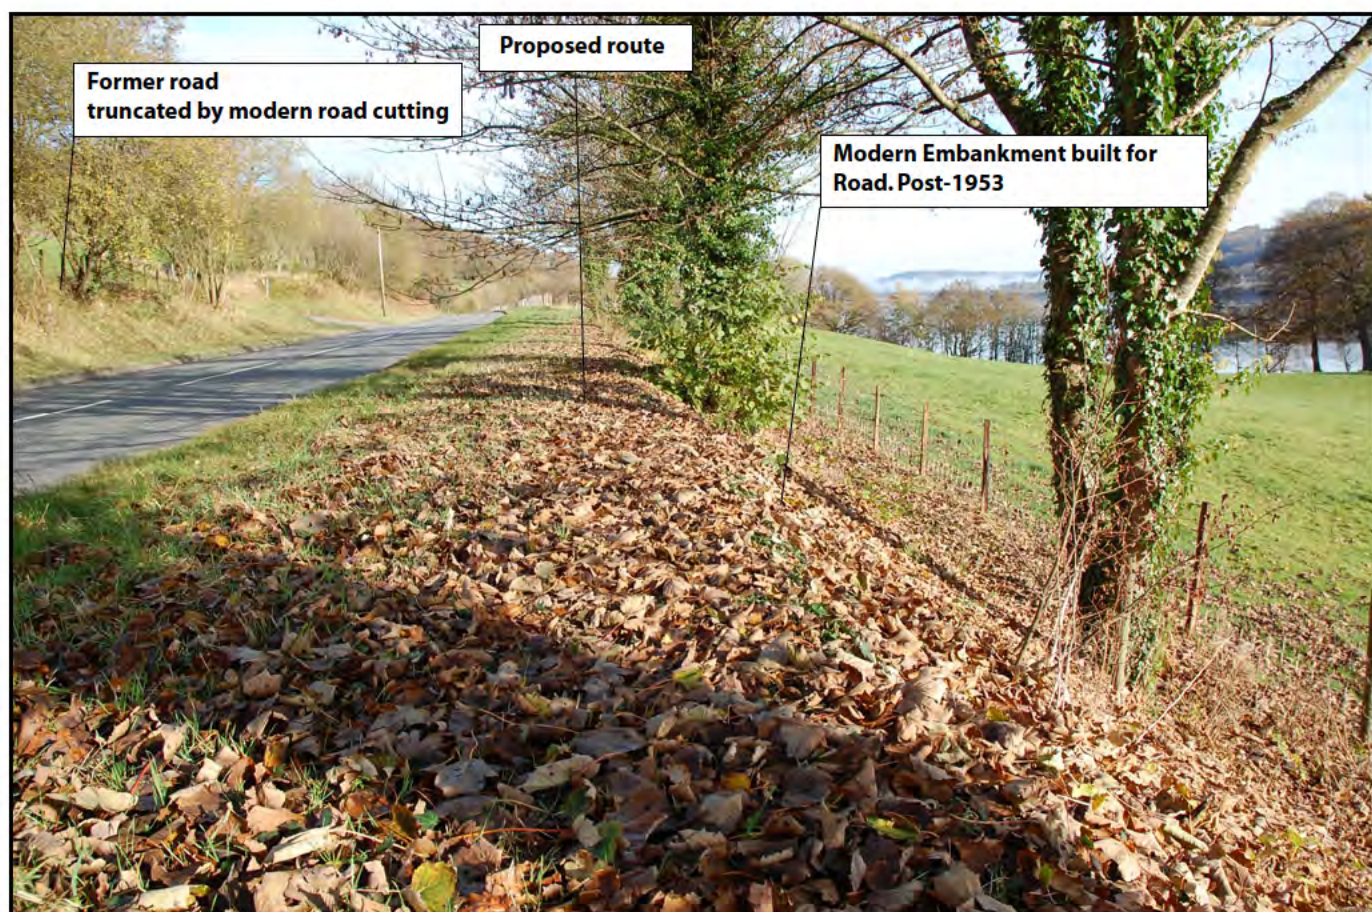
View north of the proposed cycle/footway, denoting proposed route and detailing modernised road. Note the modern embankment
